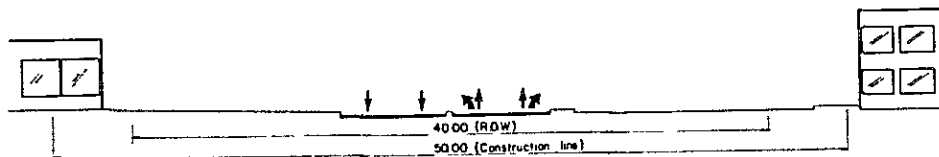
EXISTING CROSS SECTION OF VIA ESPANA(1)
